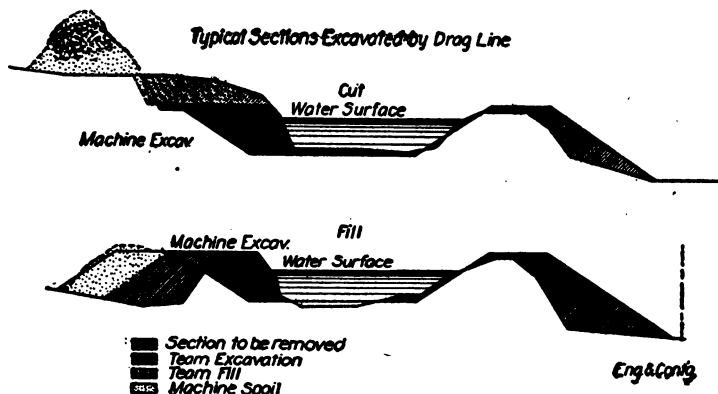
Typical Sections Excavated by Dragline Excavator.
